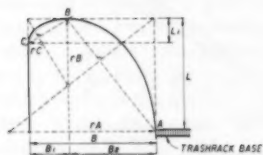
Flow Separating Pier between Powerhouse and Weir
